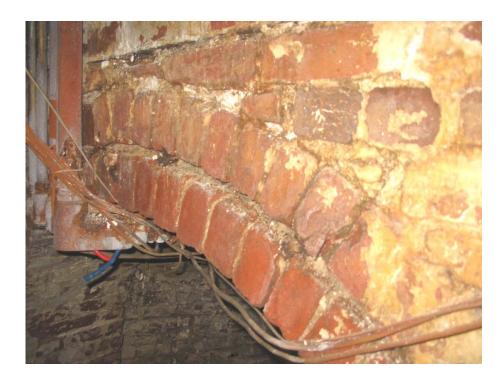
Deteriorated mortar between bricks around top of arch, south portal
